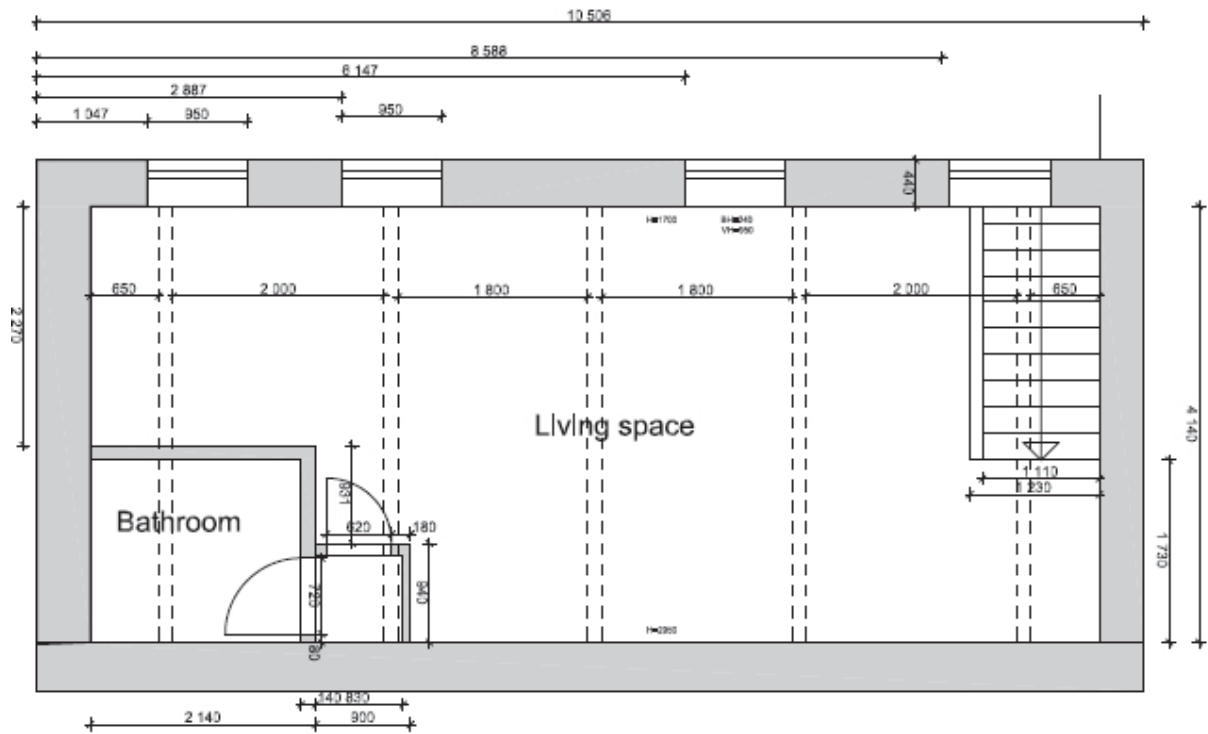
Blueprint drawing of the ground floor plan. (Source: Boligbygg).
